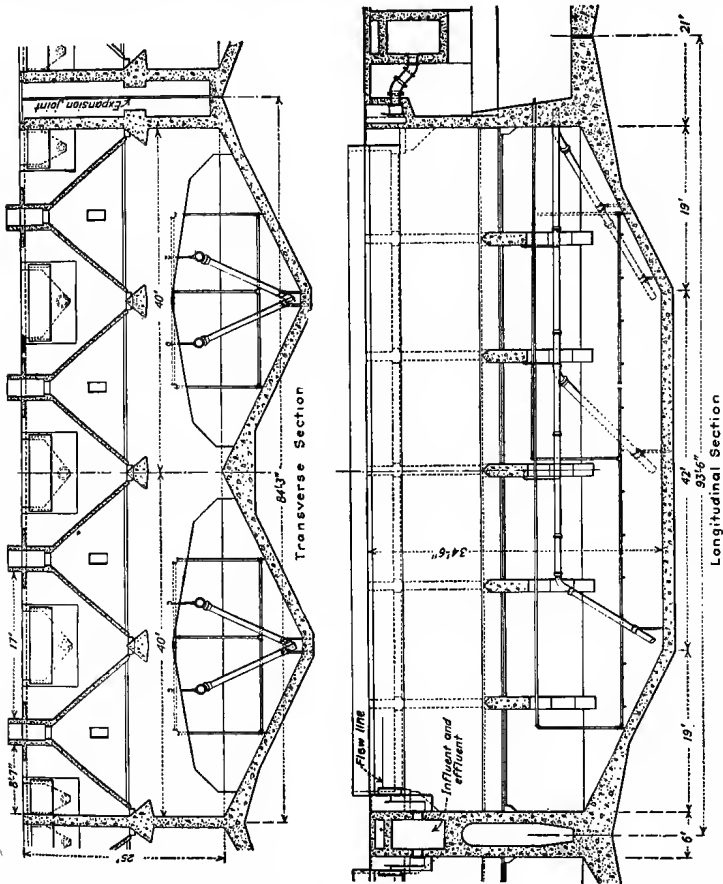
Sections of Imhoff-tank structure at West Side treatment plant, Chicago.
